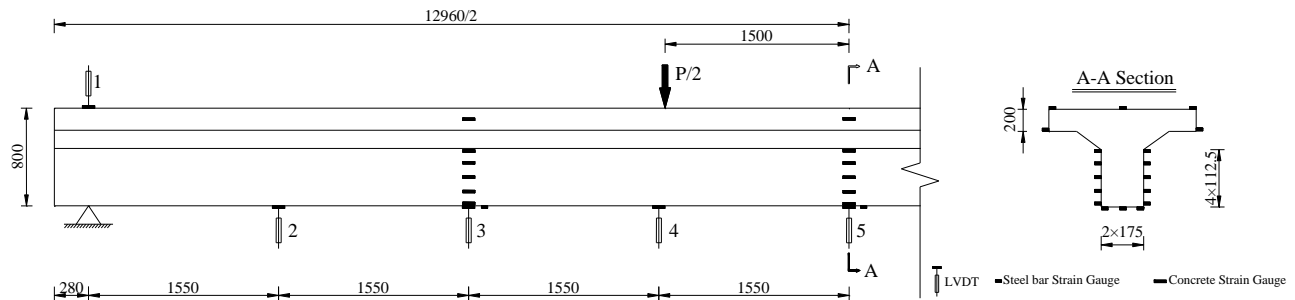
Layout of loading position and measuring point of the experimental beam (mm)
